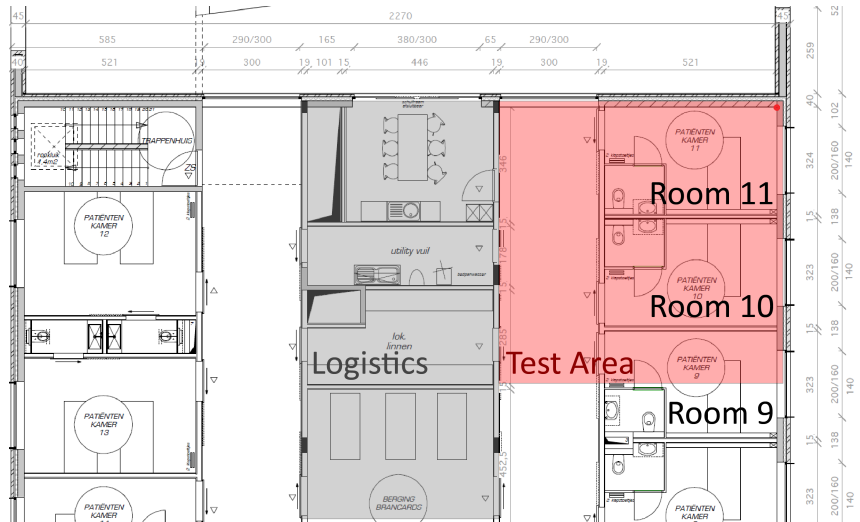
Floorplan of the hospital environment: rooms 9/10/11 and a hallway were used
